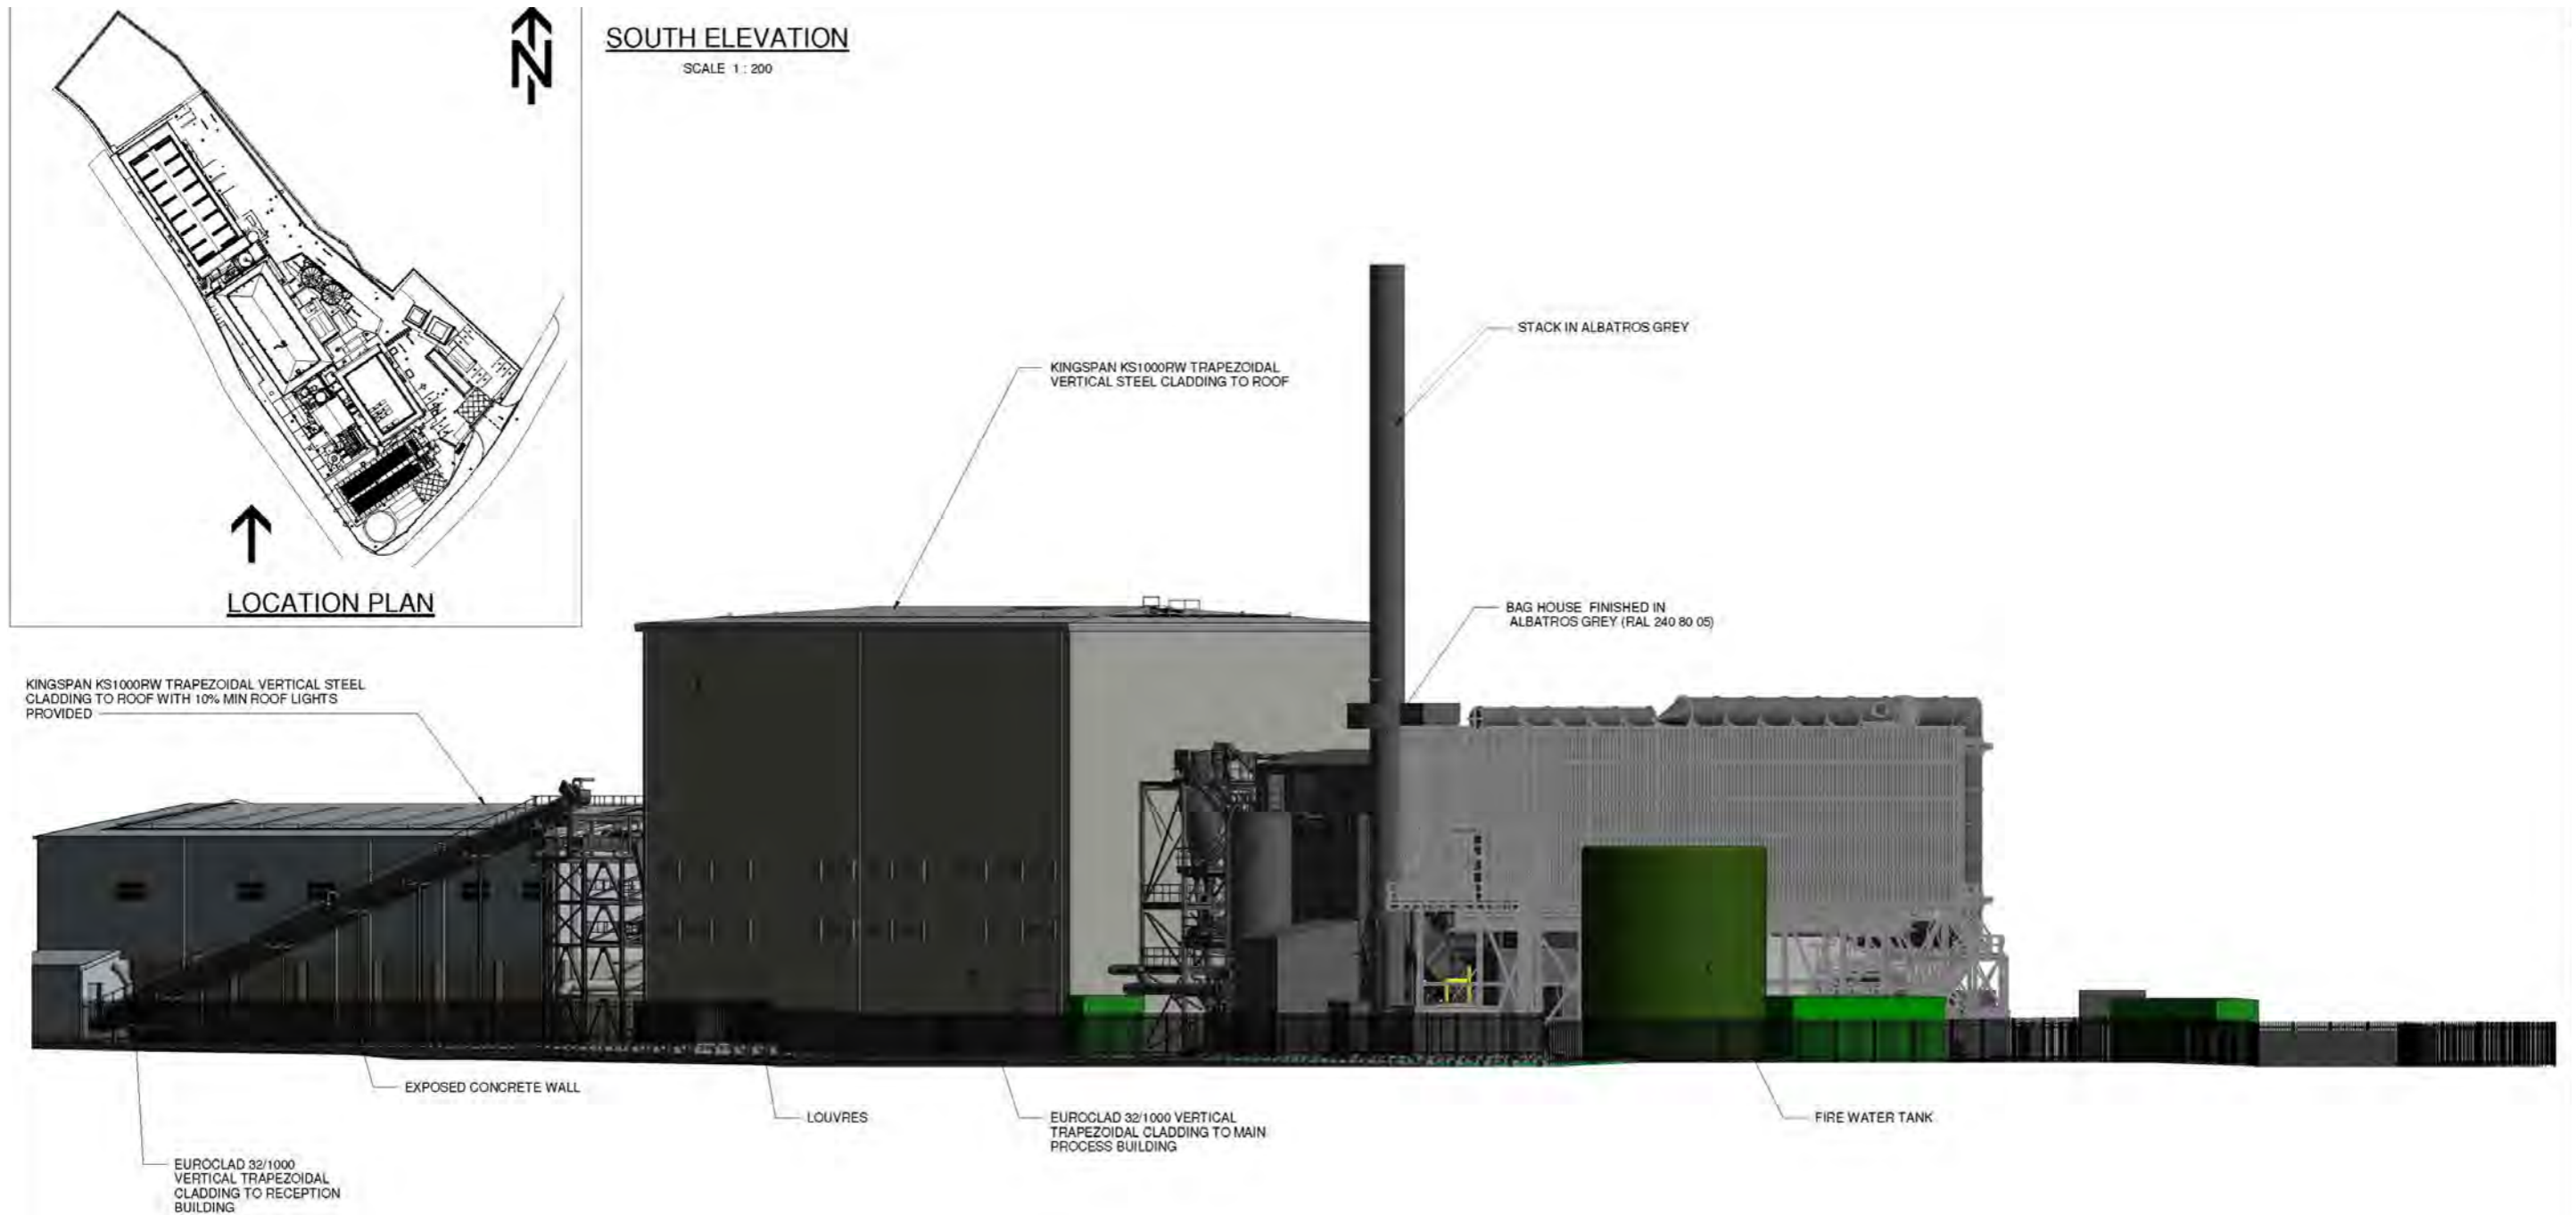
South Elevation—BARRY\_19\_DWG\_01\_40003
